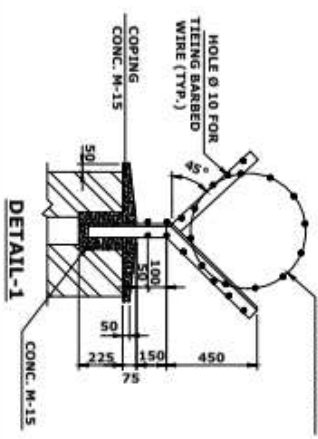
DETAILS OF MASONRY DYKE AND FIRE WALL (TANK FARM)
